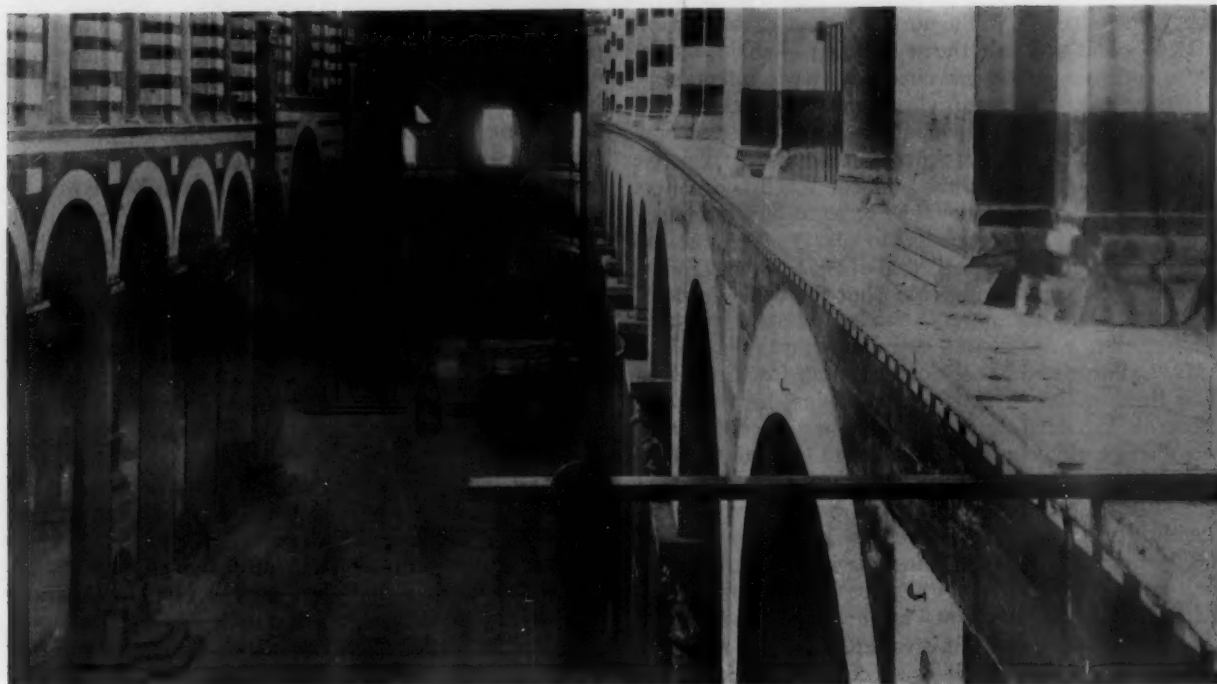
PISA CATHEDRAL. BEND IN ELEVATION, SOUTH-GALLERY PARAPET
